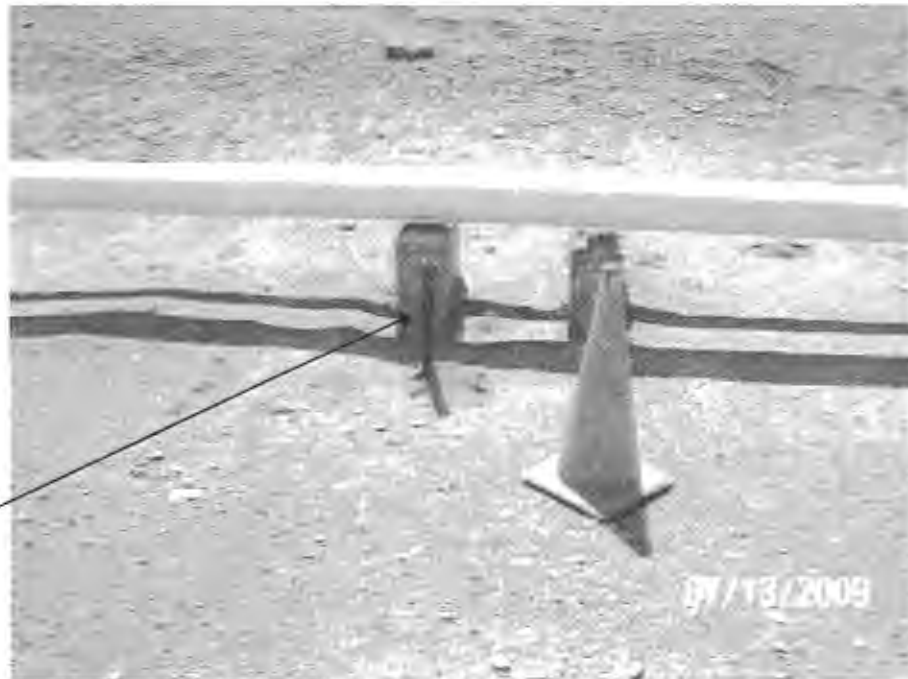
Photograph of emplaced pipe – the section with holes is inside the ground
